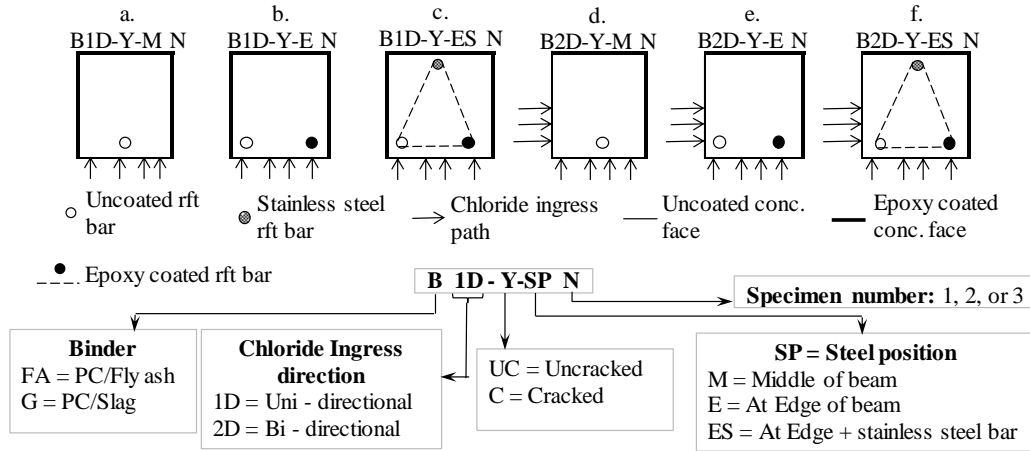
Cross section of beam specimens showing chloride exposure, reinforcement details, and specimen labeling key.
